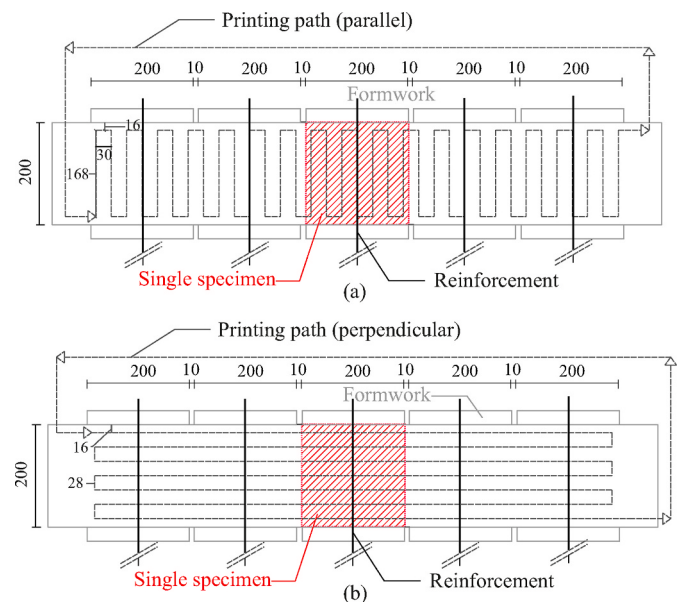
Printing path of the two configurations: (a) parallel printing path; (b) perpendicular printing path.
